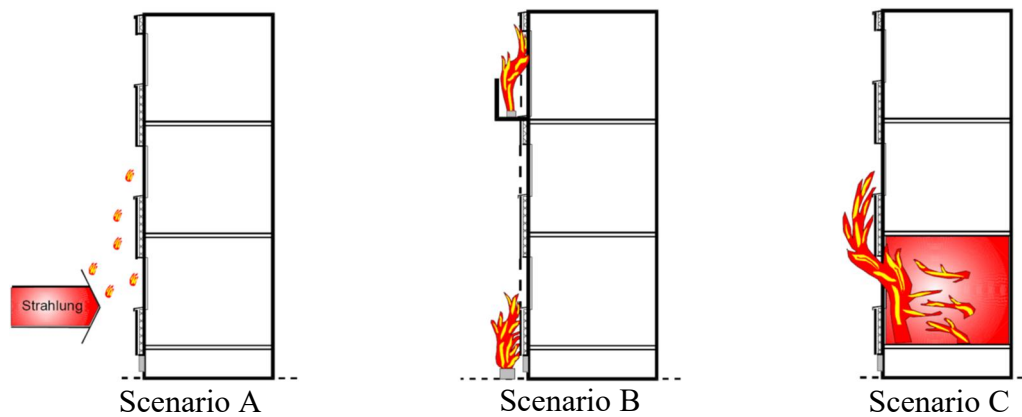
Fire scenario on exterior walls (source: Lignum Dokumentation Brandschutz)
